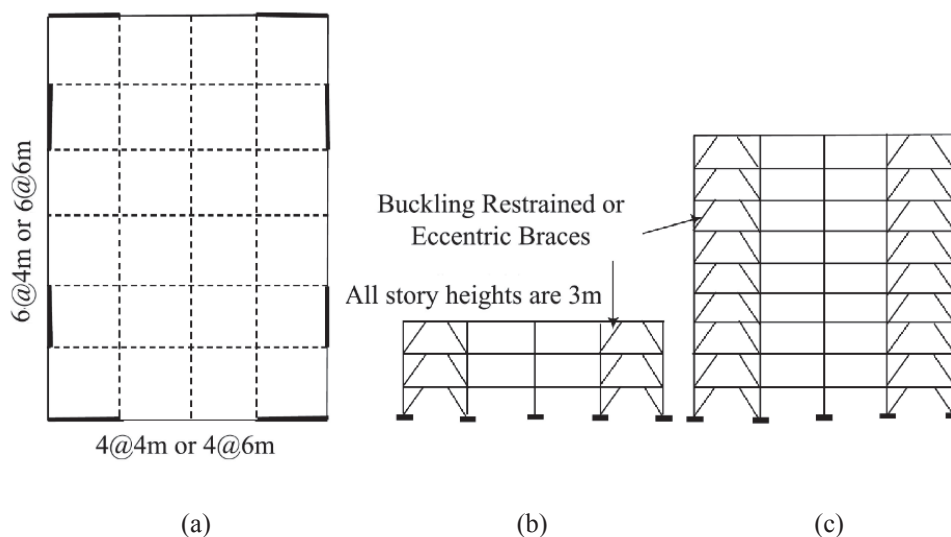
EBF and BRBF-E systems (a) building plan (b) 3 stories frame (c) 9 stories frame
